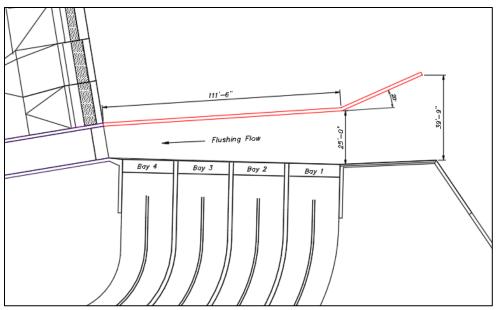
Layout of training wall with an upstream channel width of 25 ft.
